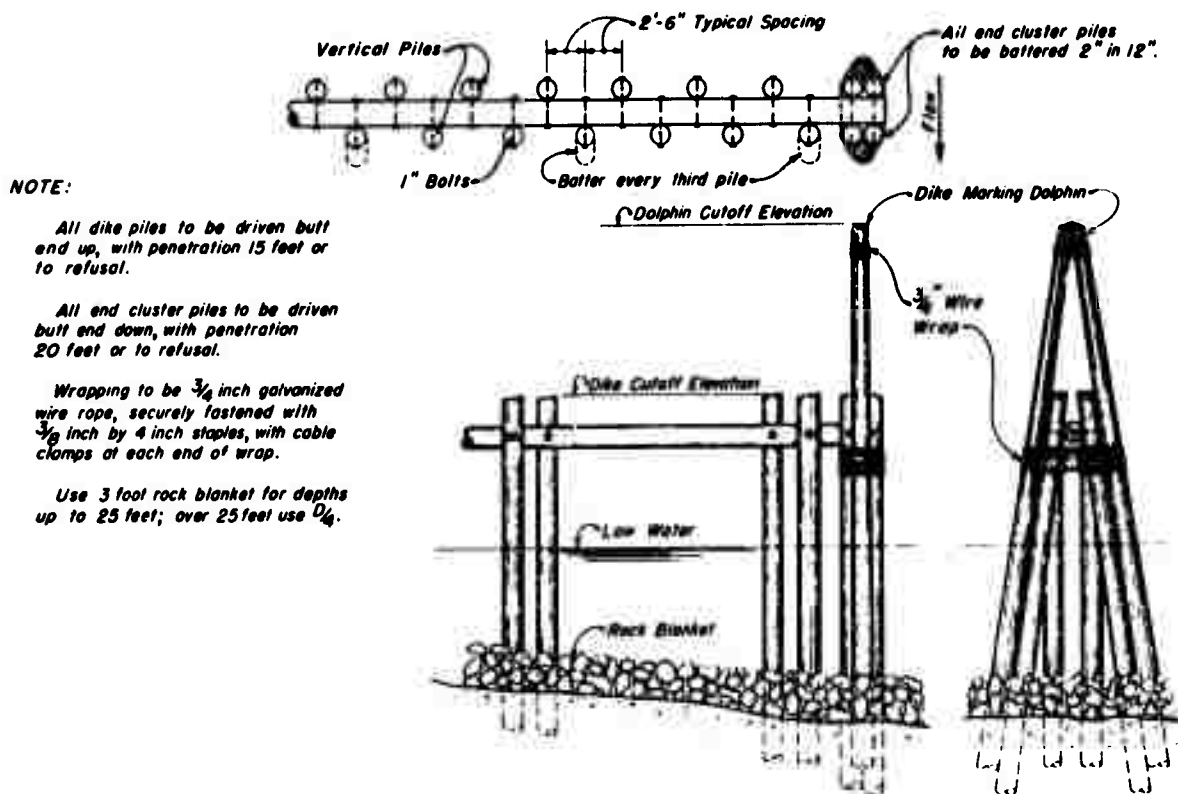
Proposed pile-dike construction, Lower Columbia River
